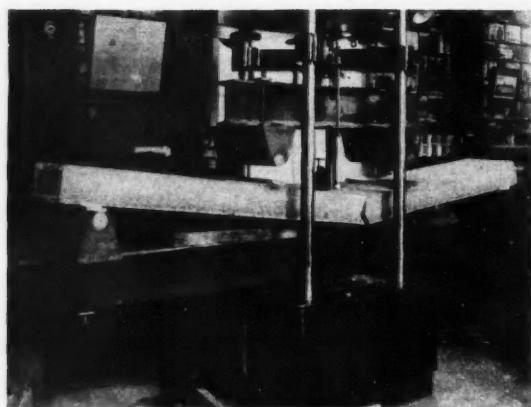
A hydraulic press at the Building Research Station is used to test the strength of a hollow concrete beam.
